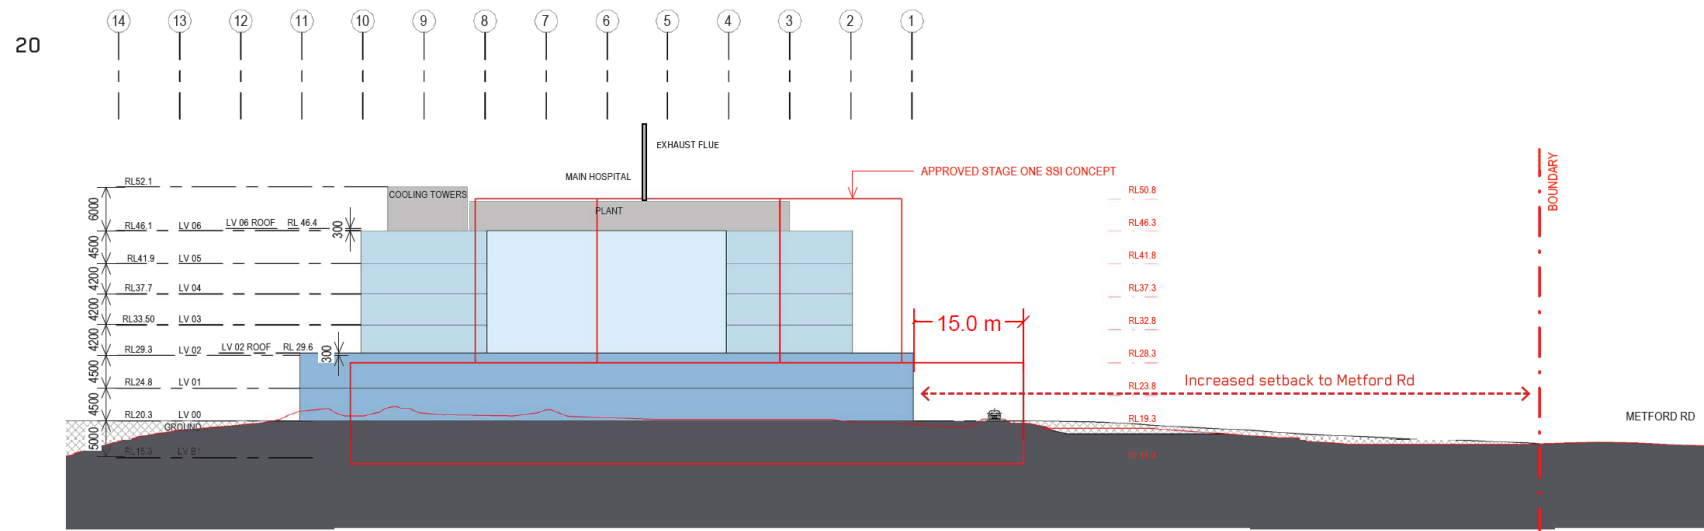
Proposed Massing North Elevation with EIS Envelope Overlaid.
